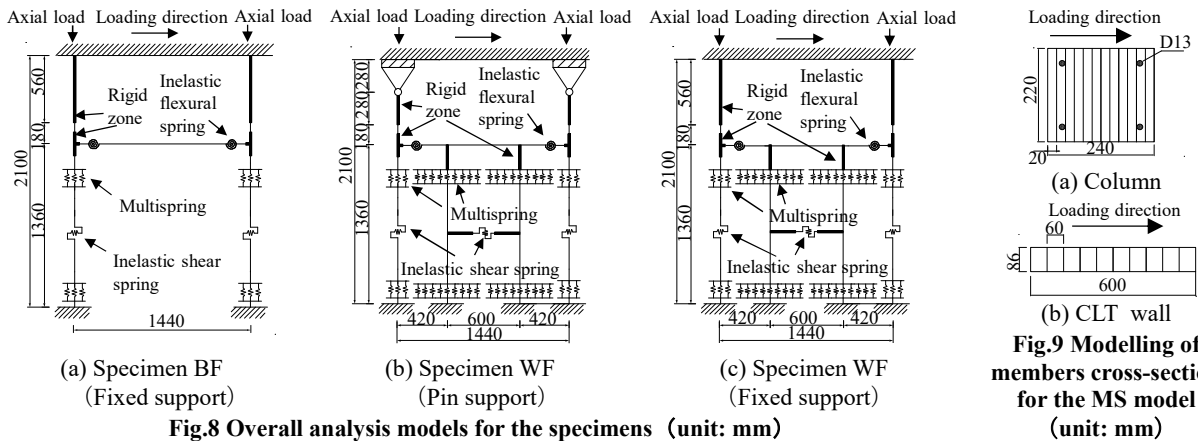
Modelling of members cross-section for the MS model (unit: mm)
